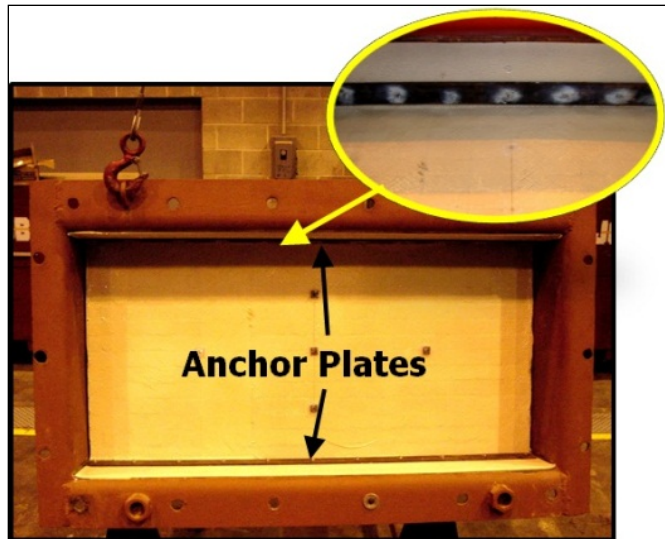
Apply anchor plates to top and bottom supports of test specimen.
